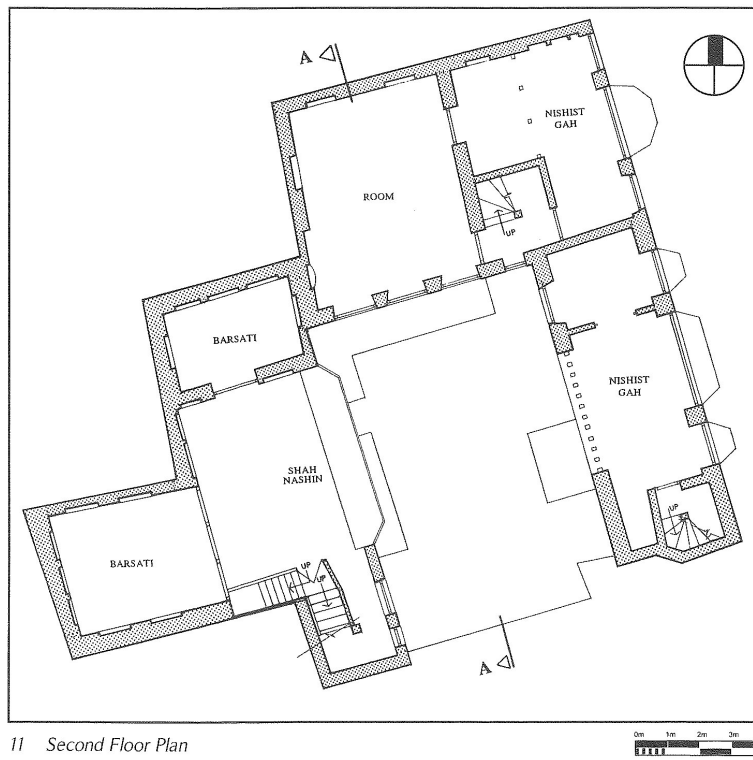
Second Floor Plan of Haveli in Lahore Mandi Bazaar.
